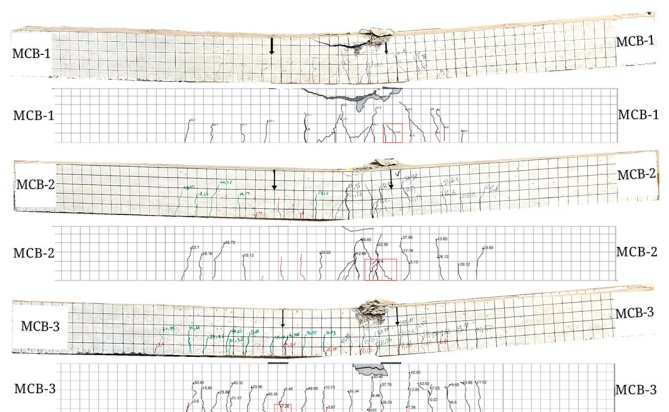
Flexural crack pattern at ultimate load for reinforced concrete beams with HCS reinforcement.
